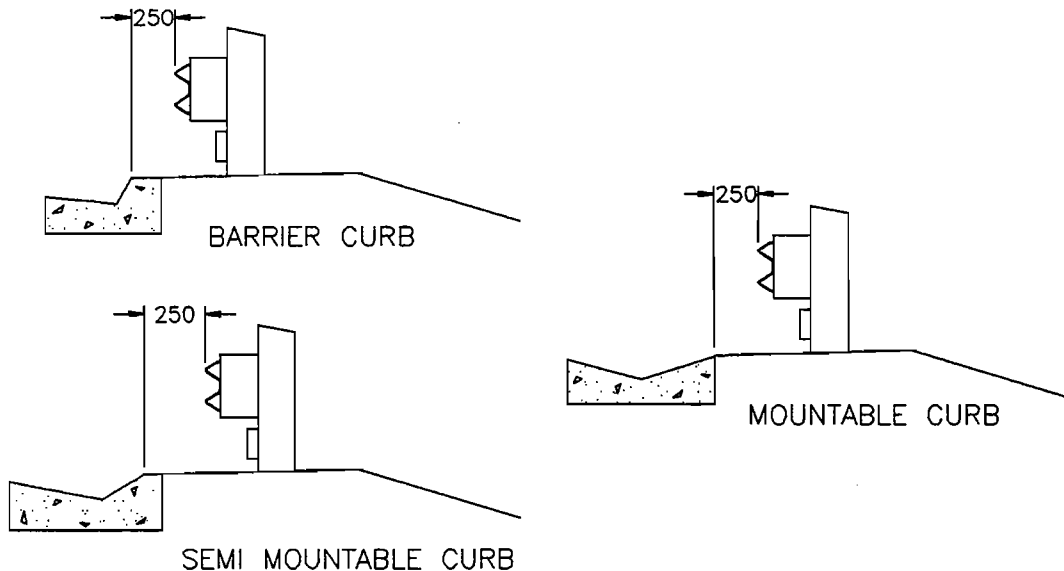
Offset from Guide Rail to Curb and Gutter
